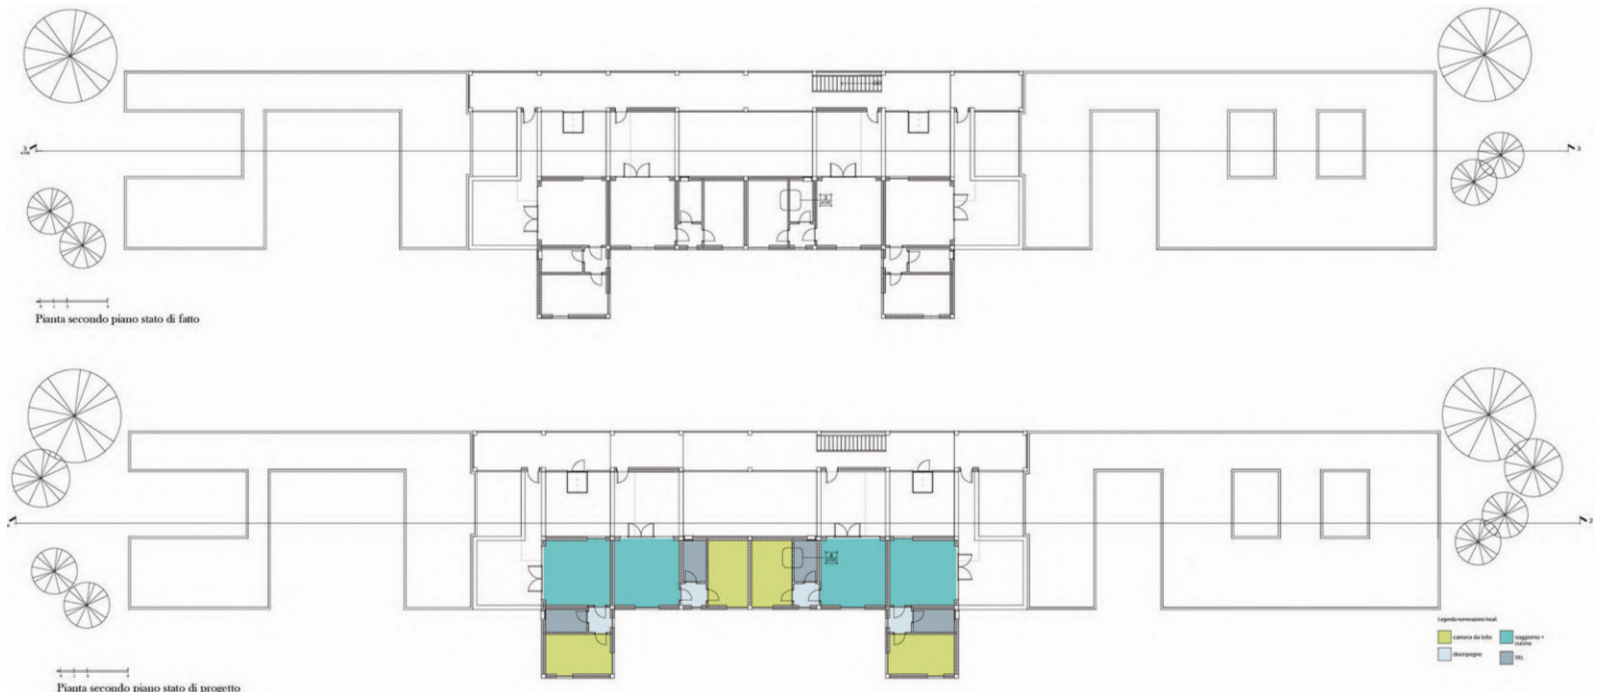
Second floor plan: comparison between state of art and project from BIM platform (credit: R. Russo).
